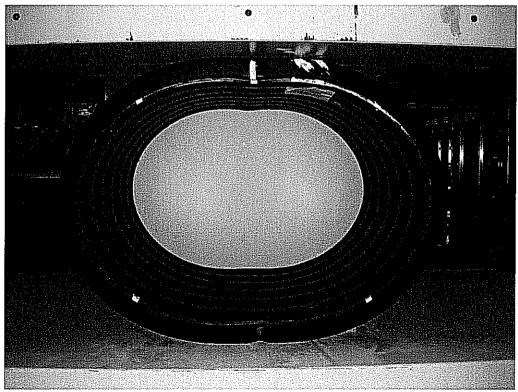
Test Pipe #1 Loaded to 30% Vertical Deflection
